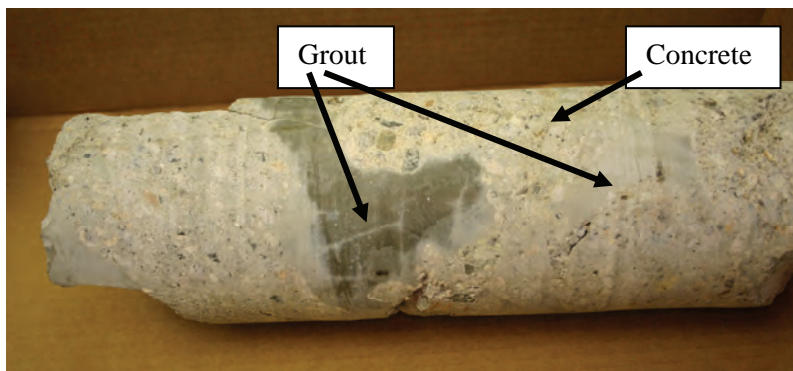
Concrete Core Through Grouted Concrete Repair (photo Ryan McTigue, Raito, Inc.)
